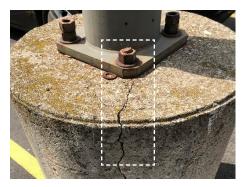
Foundation crack aligned with embedded anchor.
